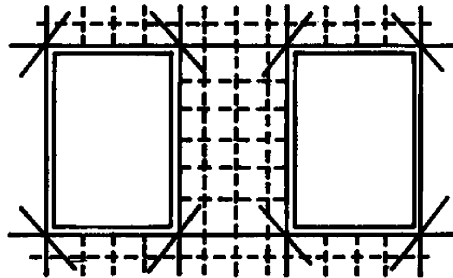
Commonly used arrangement of reinforcements in a wall between openings.
